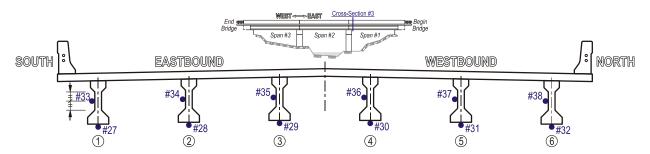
Location of the strain gages in the cross-section #3 for the tested bridge
